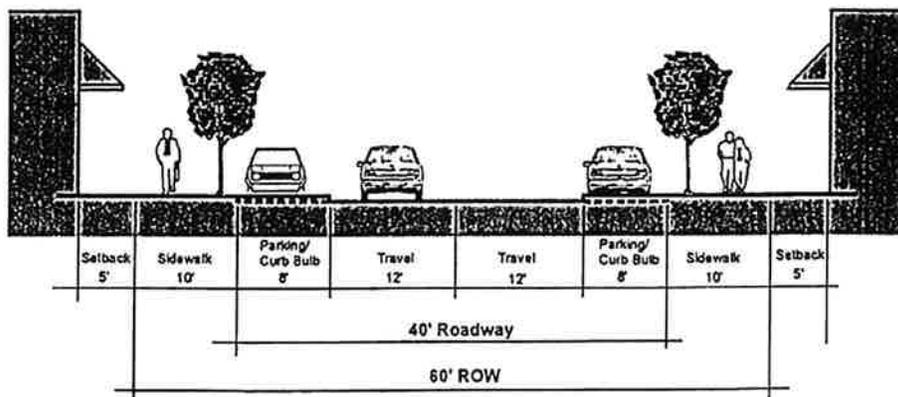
Design standards for Mashell Avenue road improvements and building setbacks.
